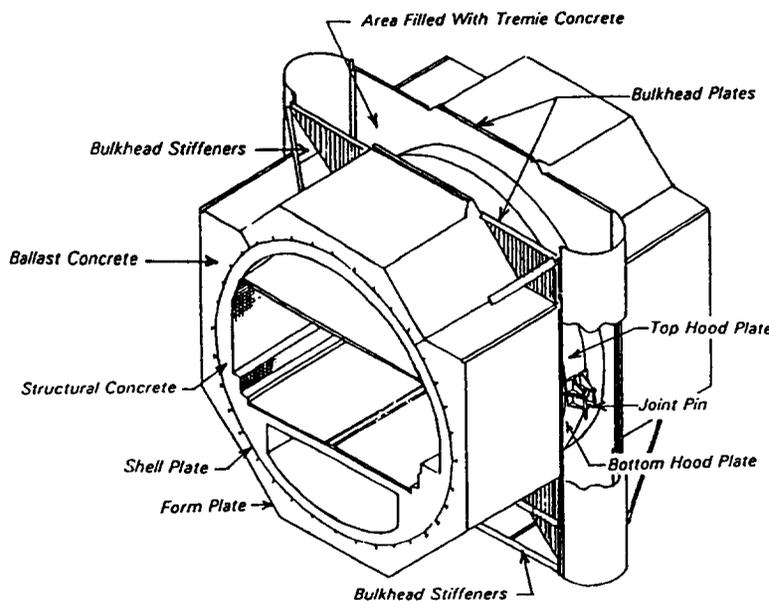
Typical tremie concrete joint for a typical steel double-shell structure.
